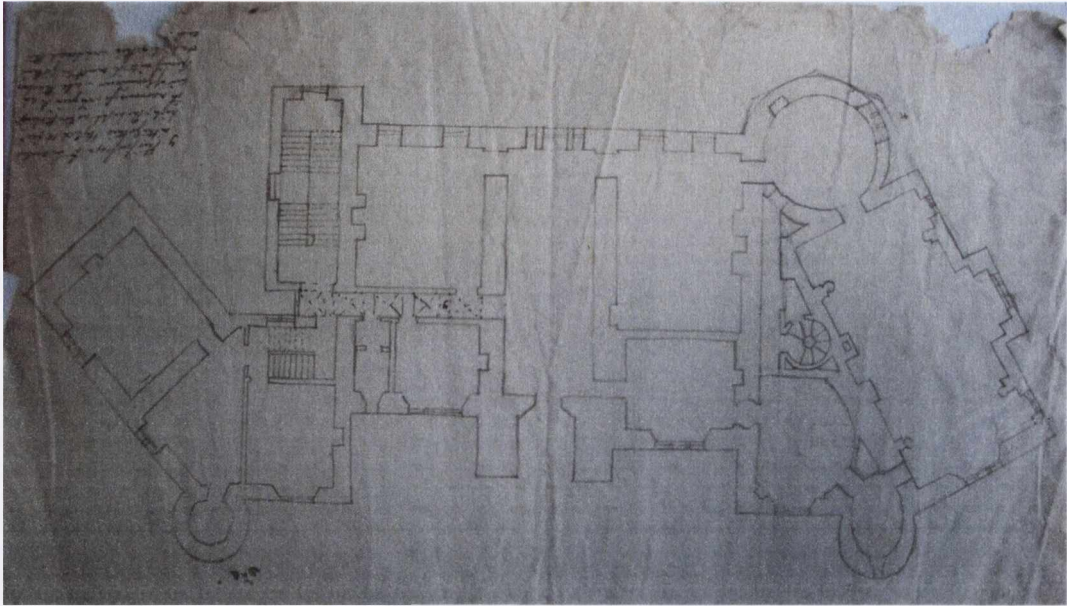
Birr Castle, proposed ground floor plan, attrib. to John Johnston, [1802–1804], Rosse papers, O/17/14.
